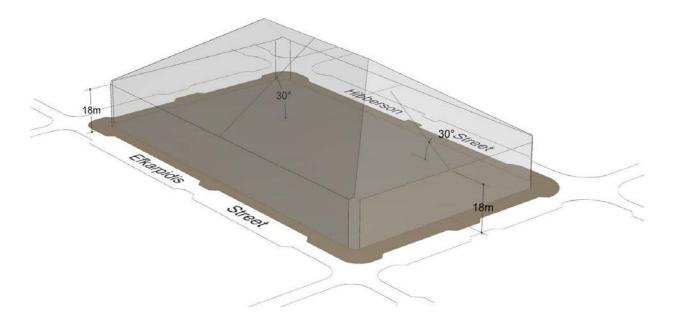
Building envelope in Precinct 1a (north side of Hibberson Street)
